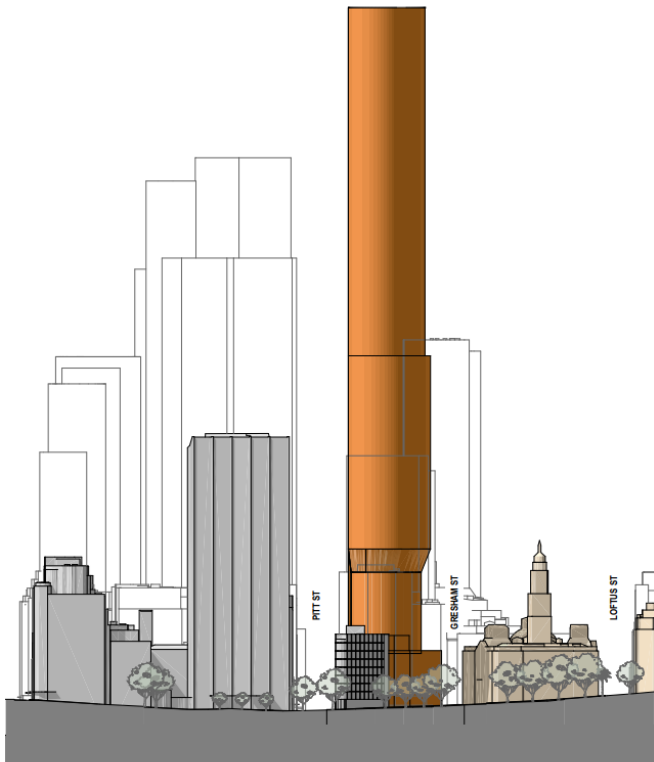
XX Pitt and Bridge Street, Sydney – planning envelope elevations
